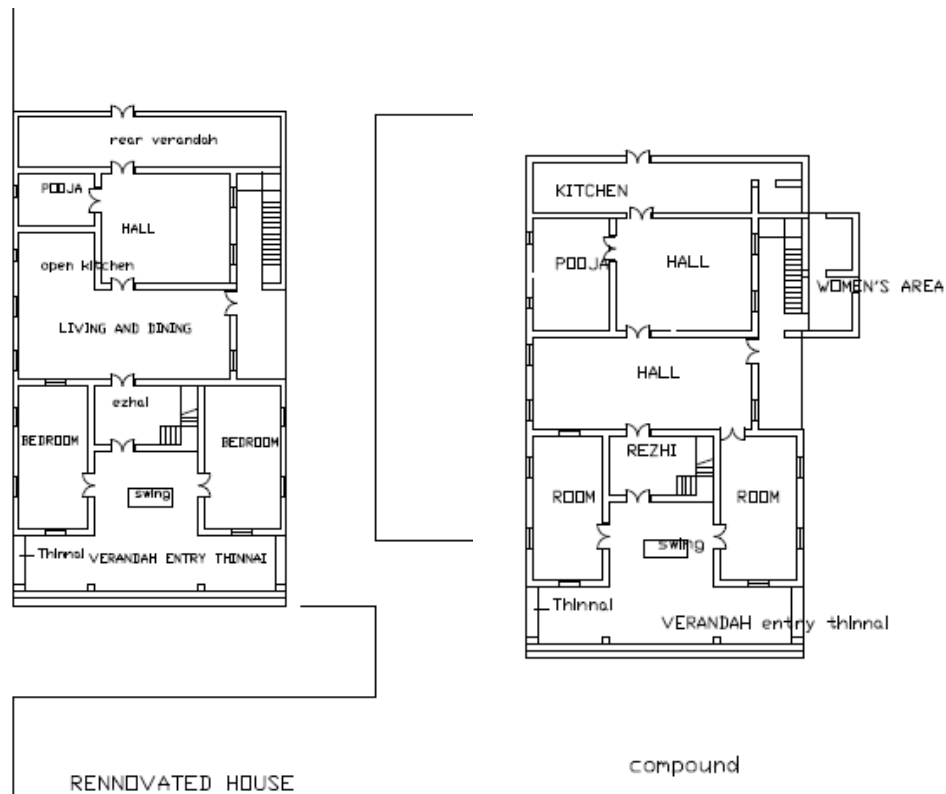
Plan of House 6 showing Entry Verandah and Thinnai
